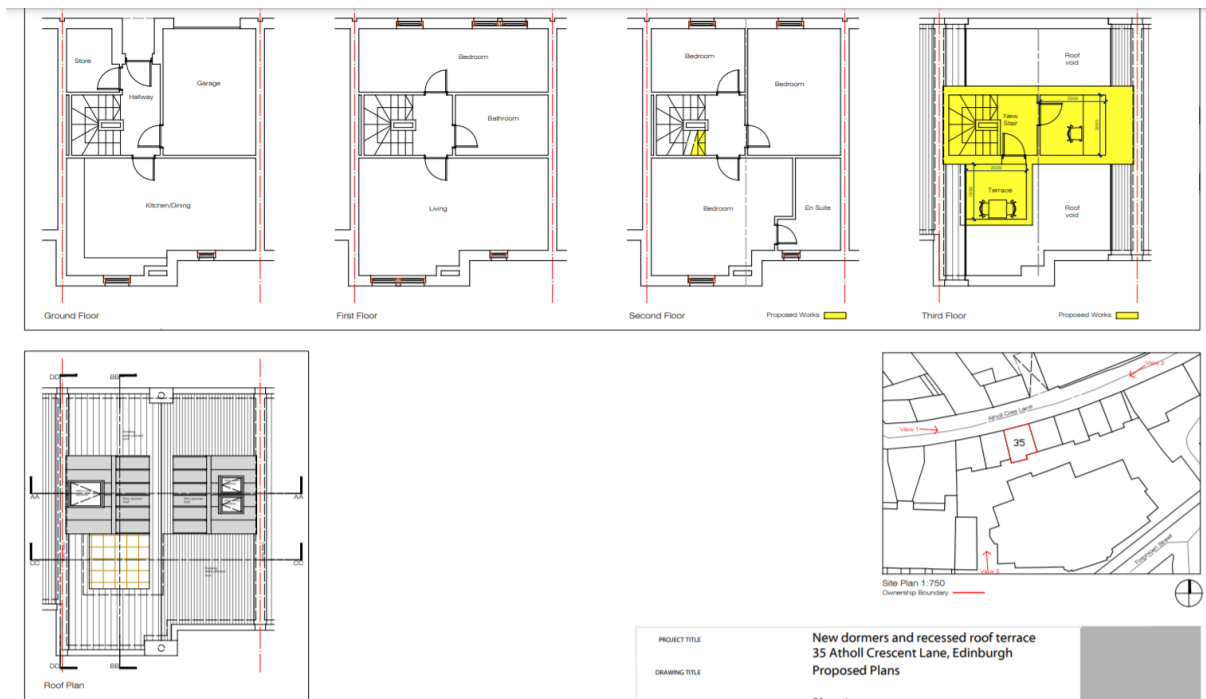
above: Approved floor plan for planning consent LPA ref: 20/02782/FUL.
